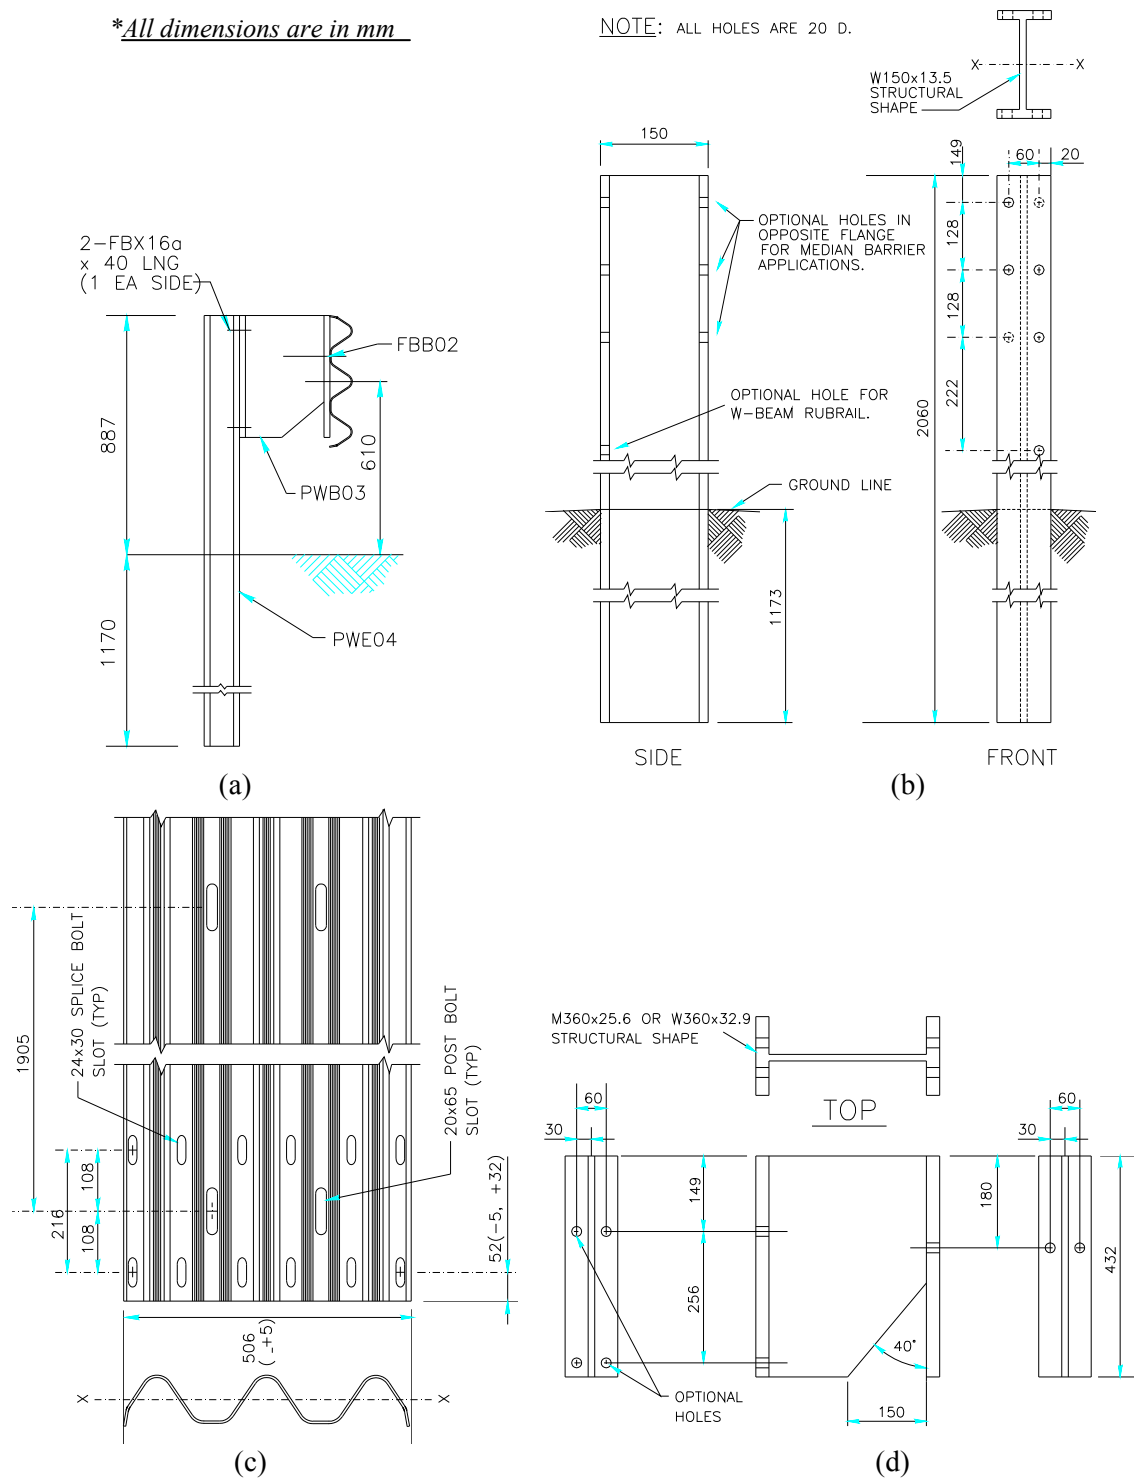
Detailed drawing of (a) Modified Thrie-beam guardrail, (b) Wide-flange guardrail post (PWE 04), and (c) 2-space Thrie-beam guardrail (RTM 01a) (d) modified Thrie-beam blockout (PWB03) (6,13).
